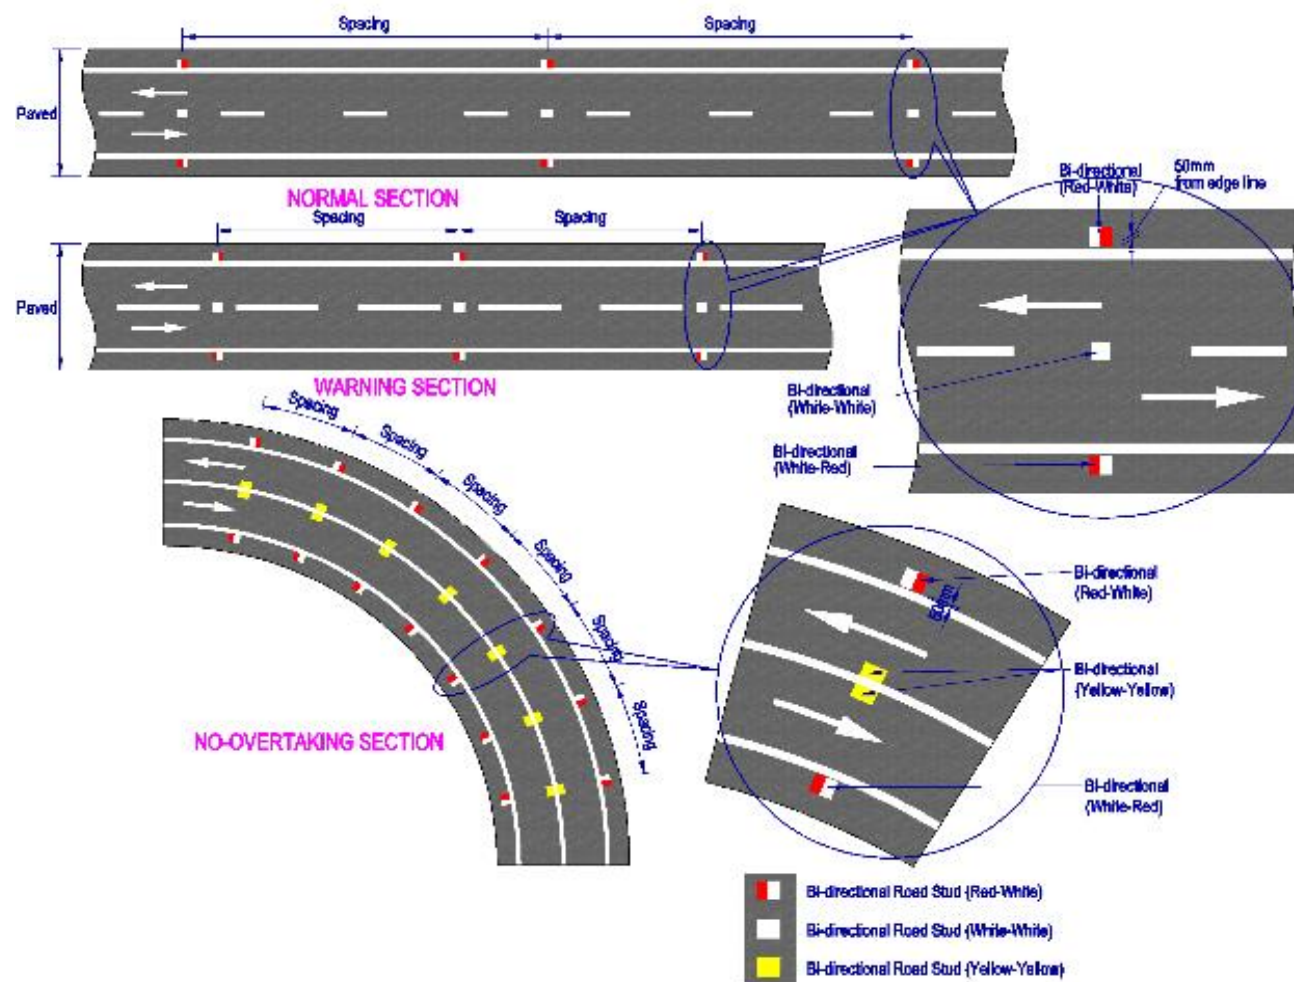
Placement, colour and spacing of road studs on undivided roads
